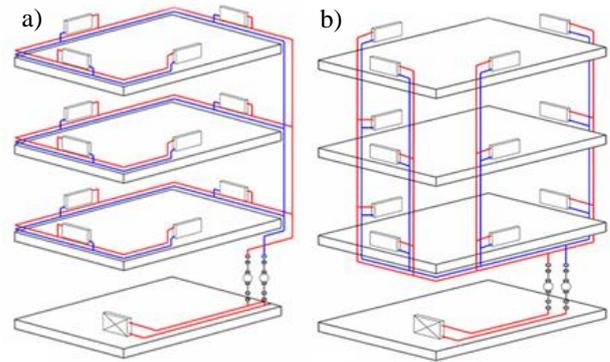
a) single column central heating system, b) multi-column central heating system [19]
